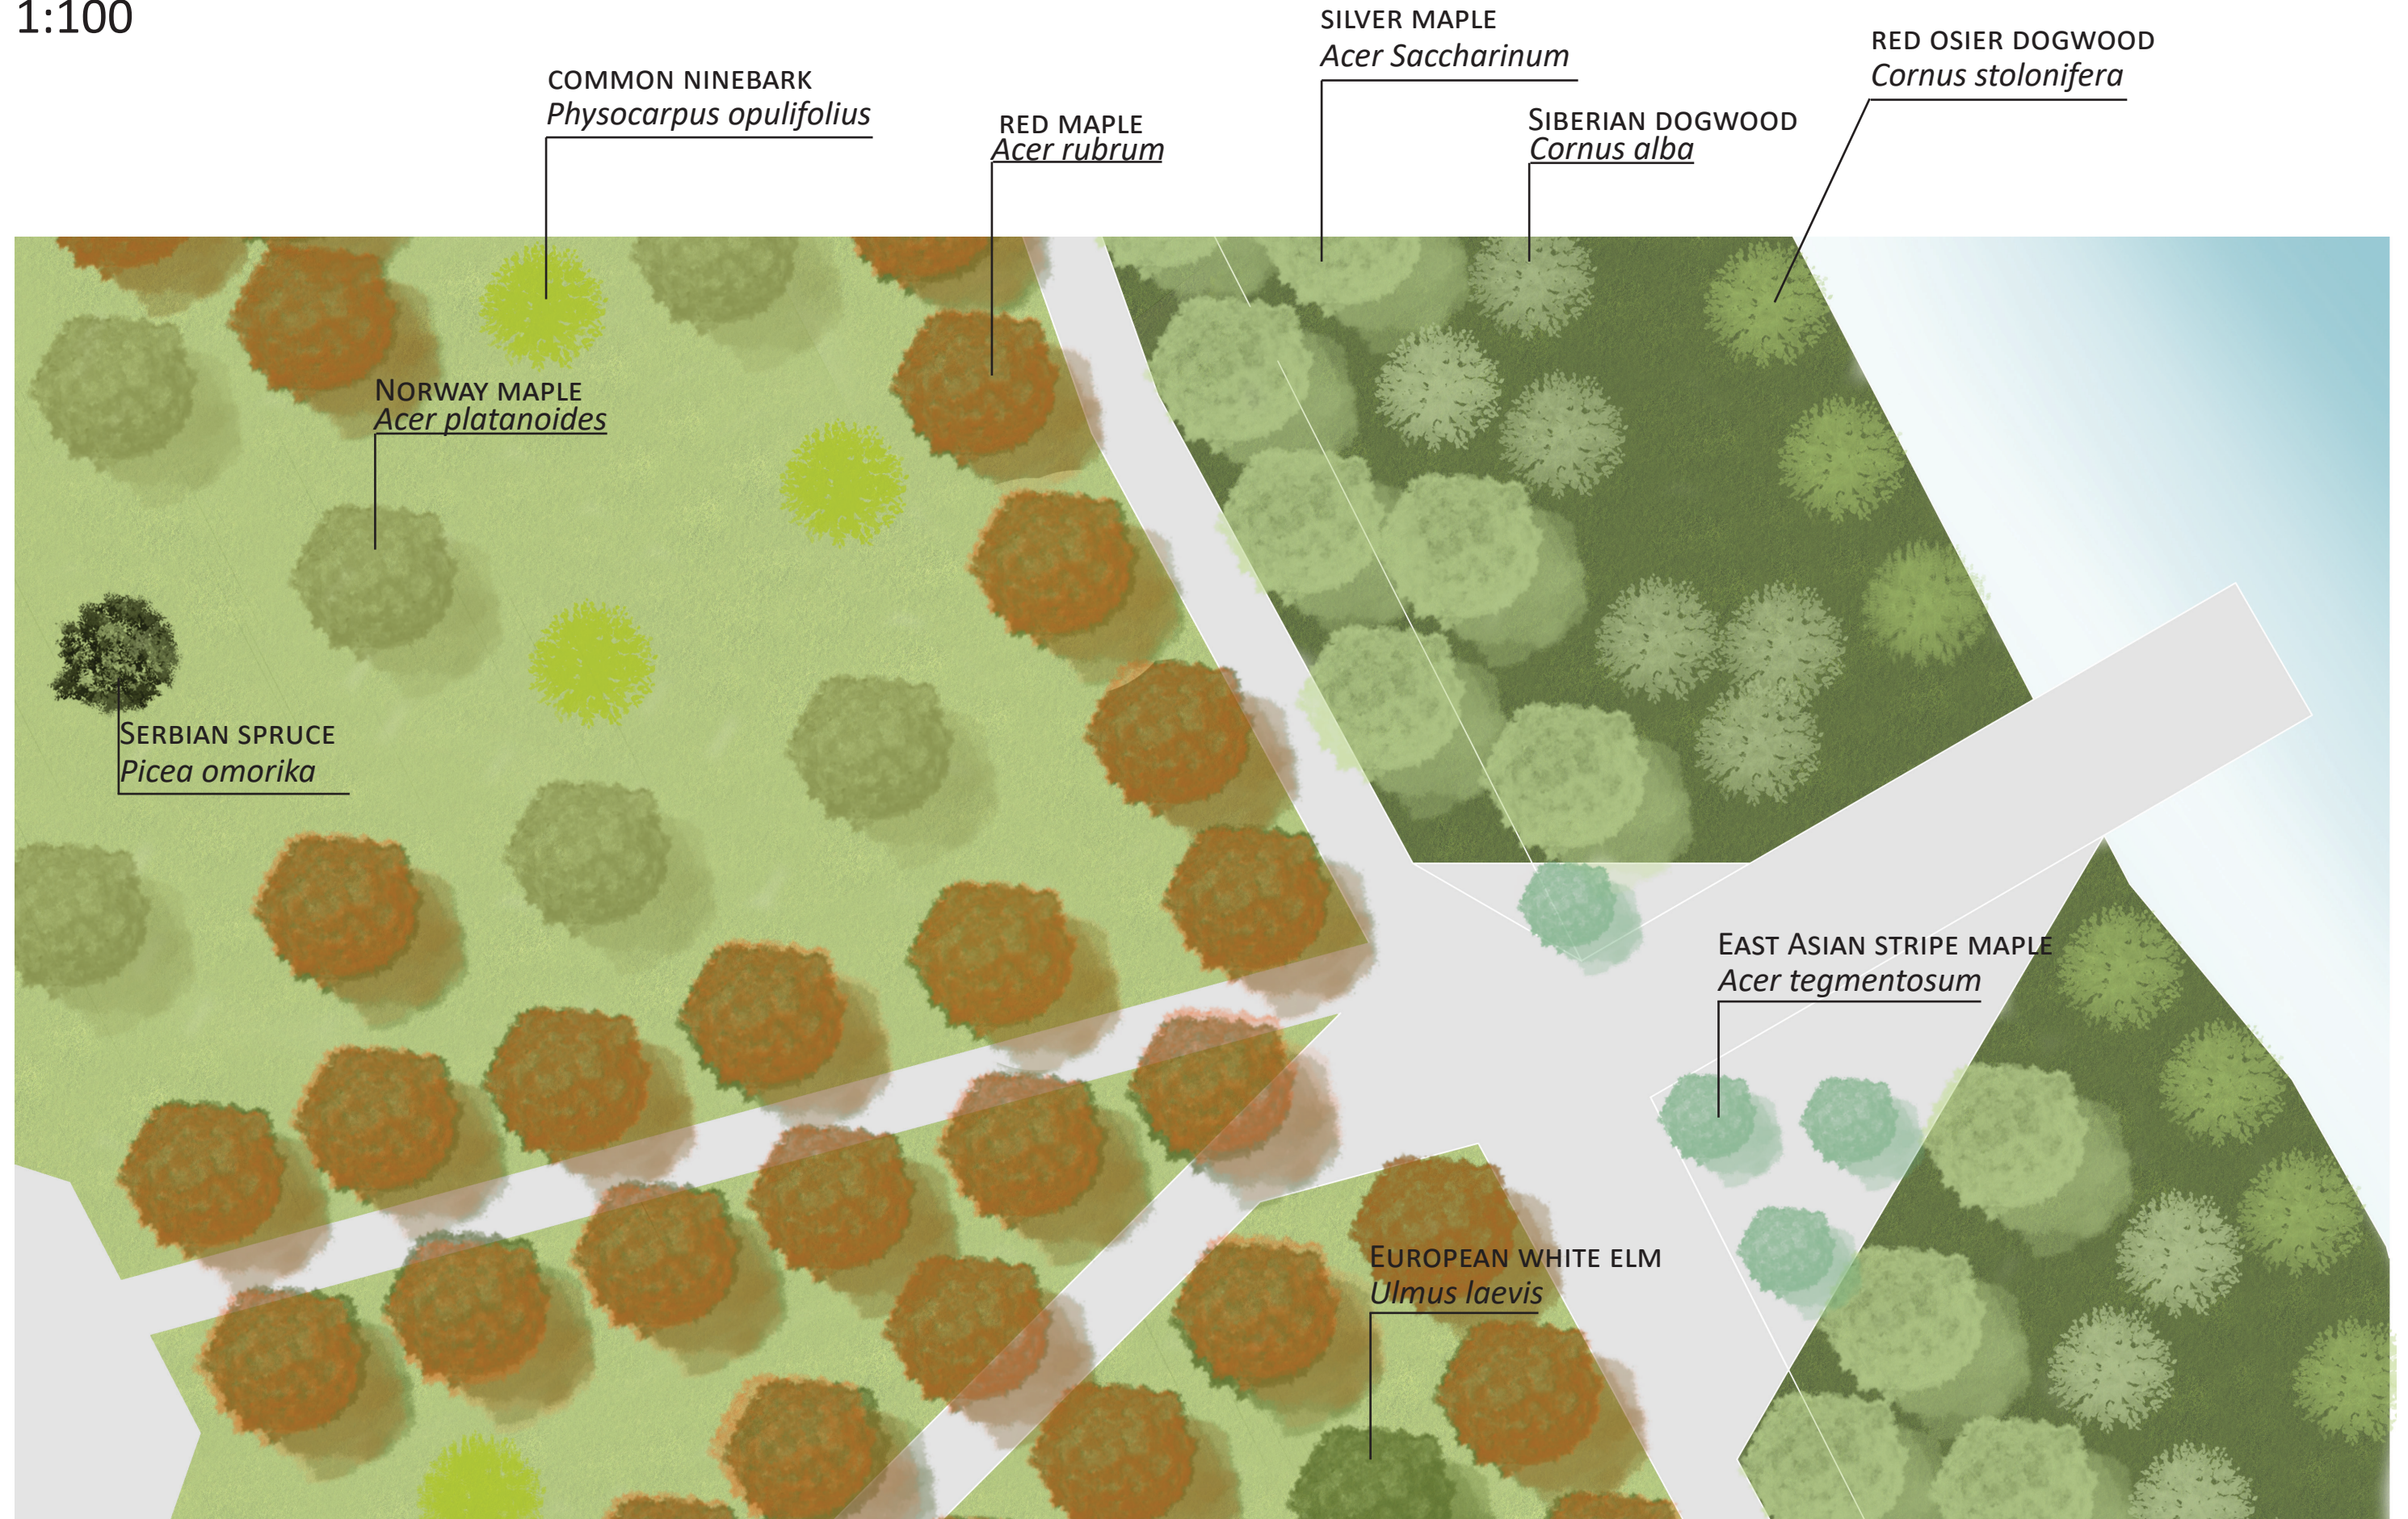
Planting plan showing the space around the new building area with new plants. (PLanting plan 1:100)
